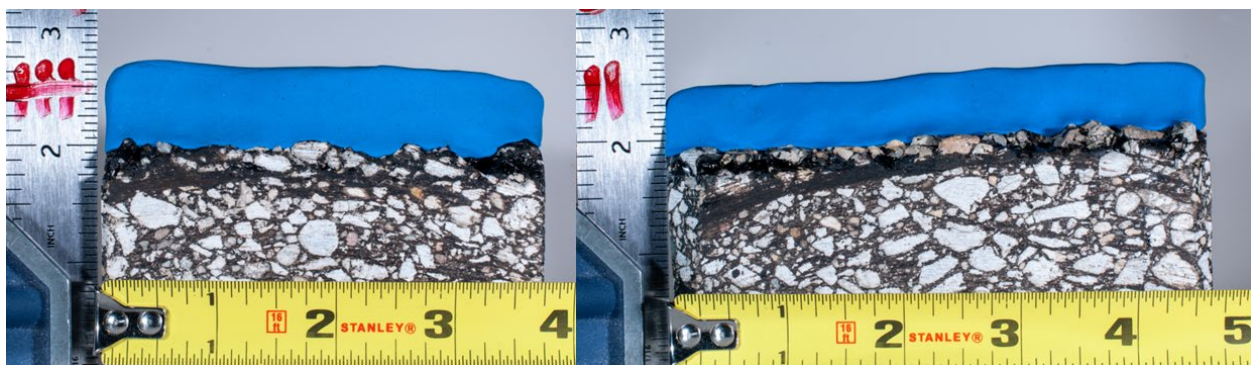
Photo. Side-view photos of trimmed cores showing the cross section of the chip seal layer and the underlying pavement layer.
